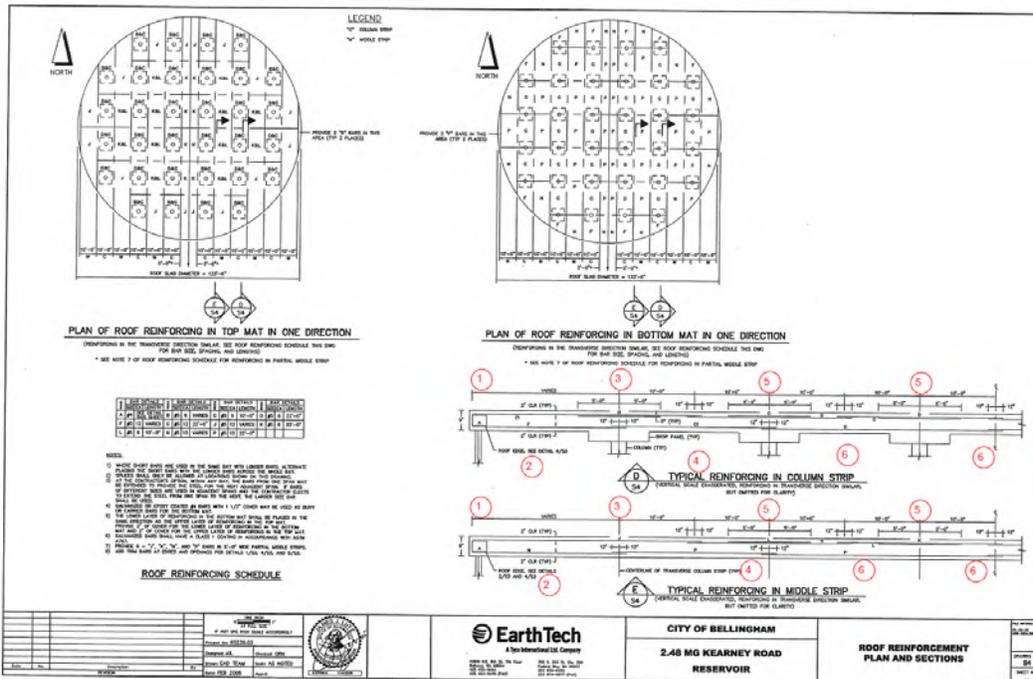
Kearney Roof Reinforcement Plan and Sections
